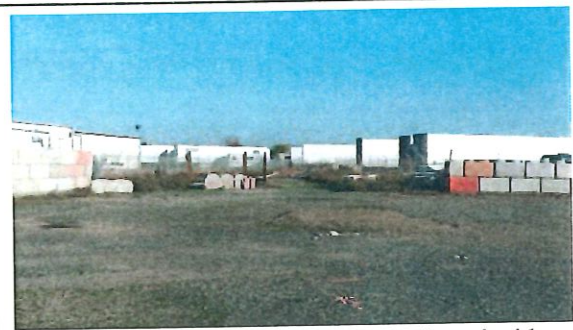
View of northeast corner from inside the site. November 14, 2016.
